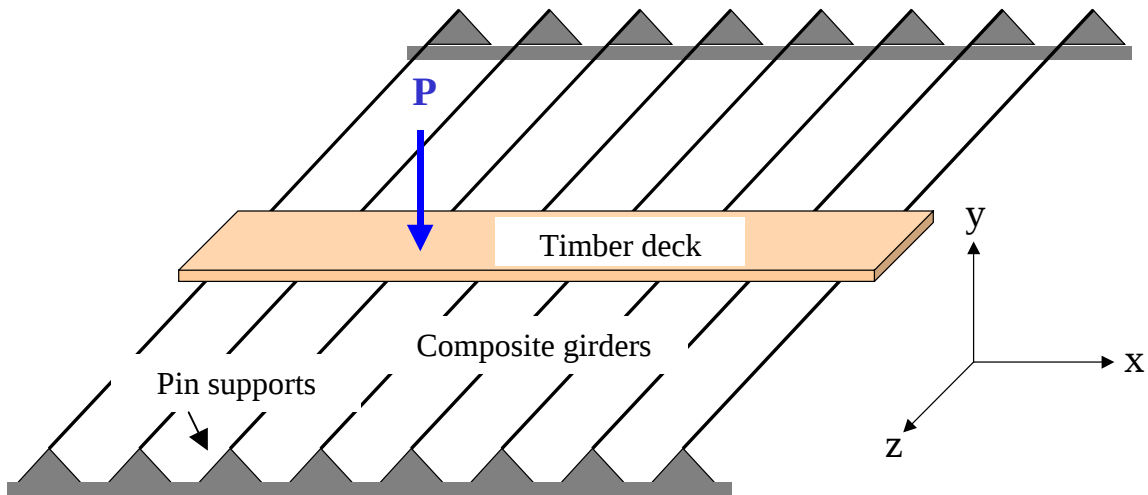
Model of bridge as single deck beam on underlying girders (only eight girders are shown).
